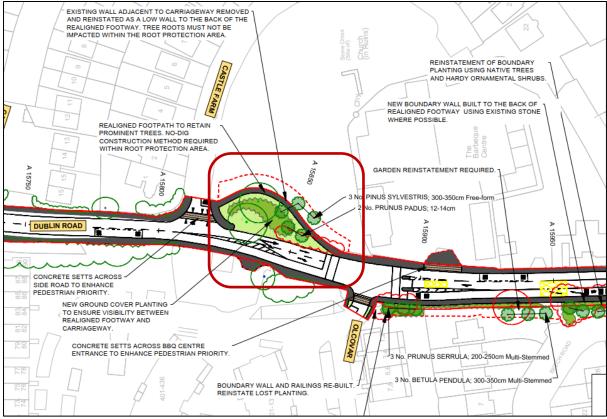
Extract from Landscaping Drawing at Castle Farm (Sheet 45)
